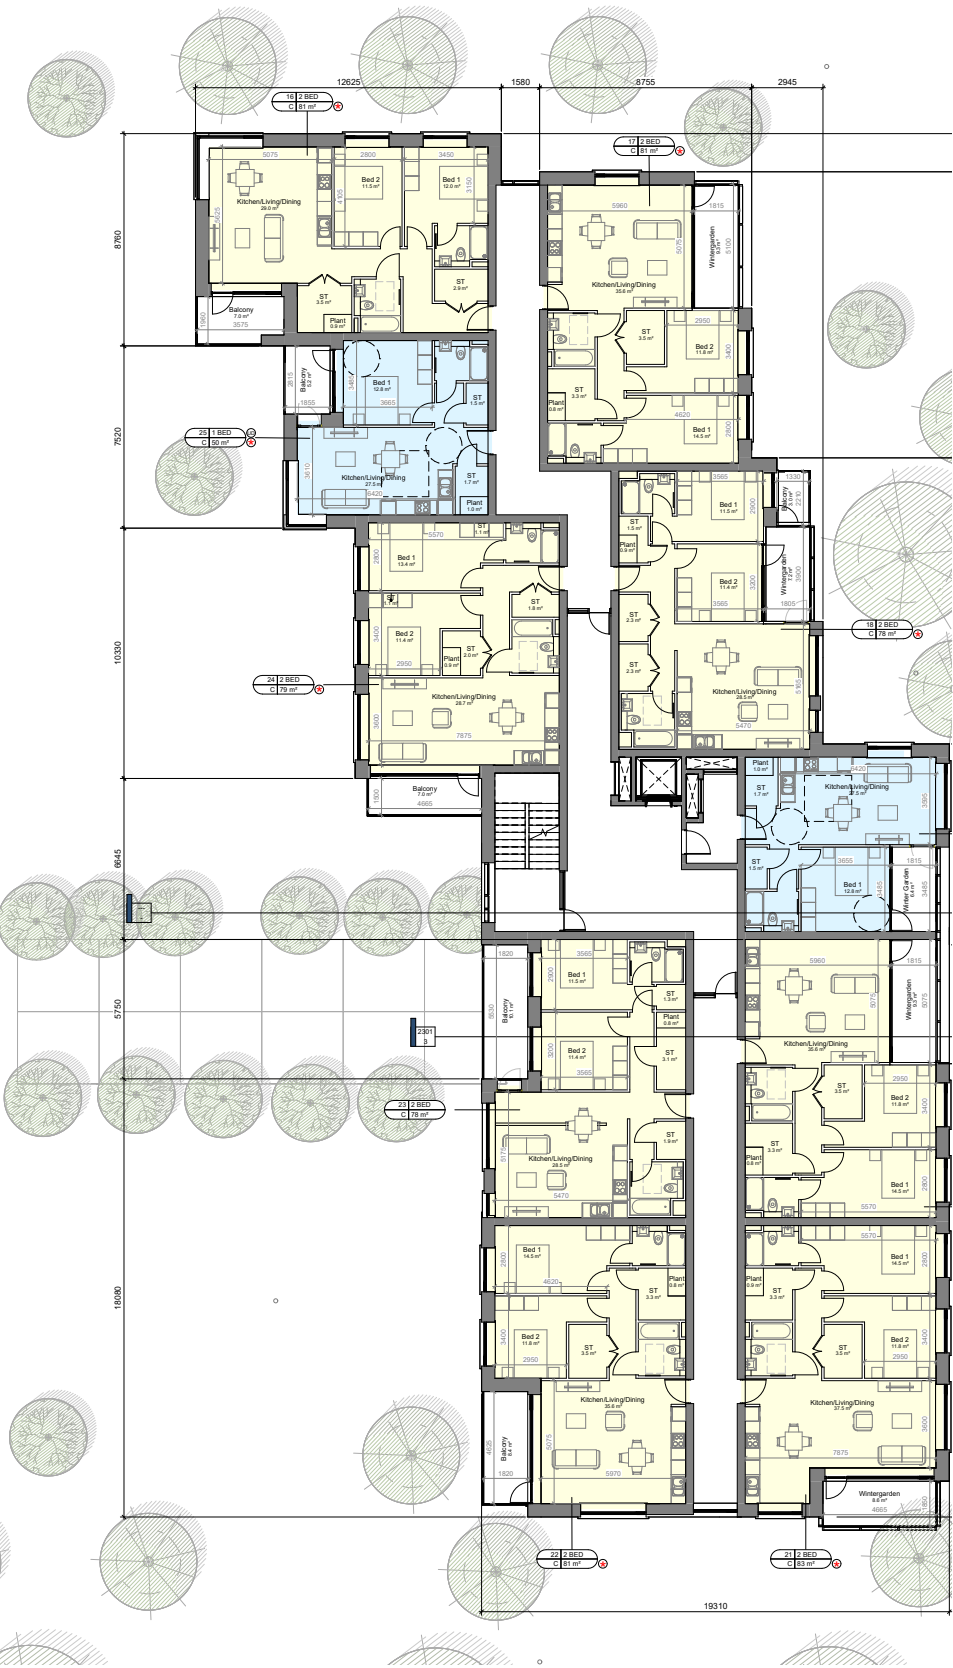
Block C - Second- Fifth Floor Plan Source: MCORM, 2026.
